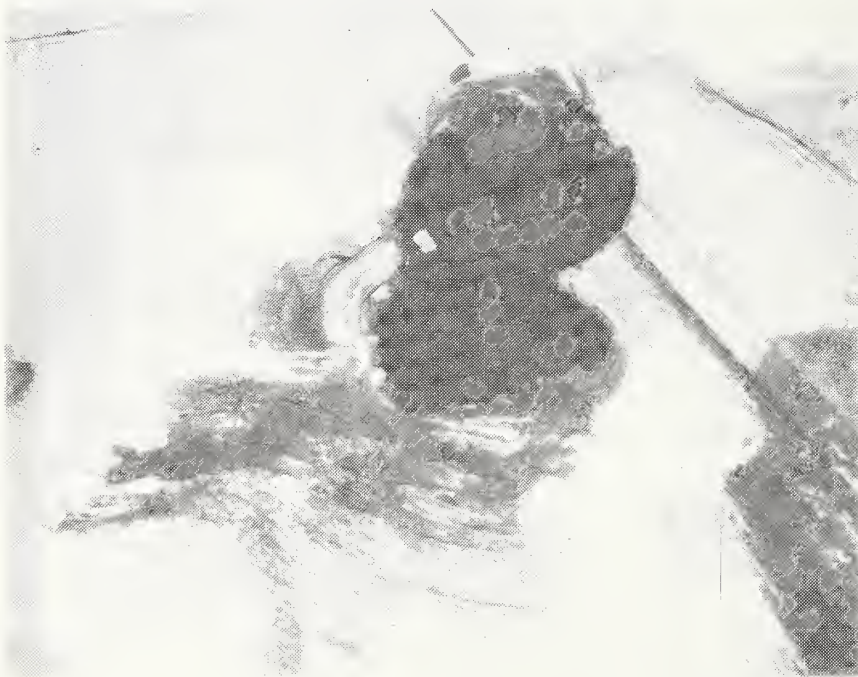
Vent Cap Removal Damaged the Flashing.
